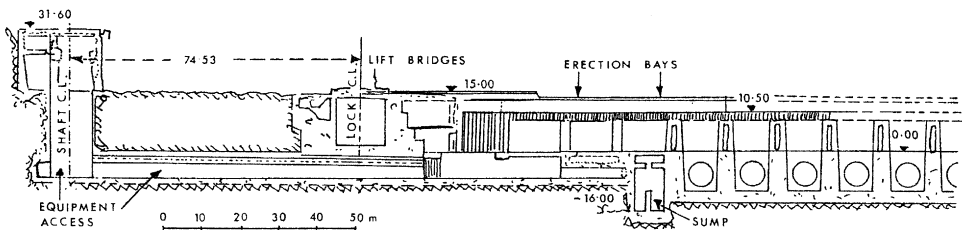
Cross-cut showing access shaft, lift bridges and erection bays location.
